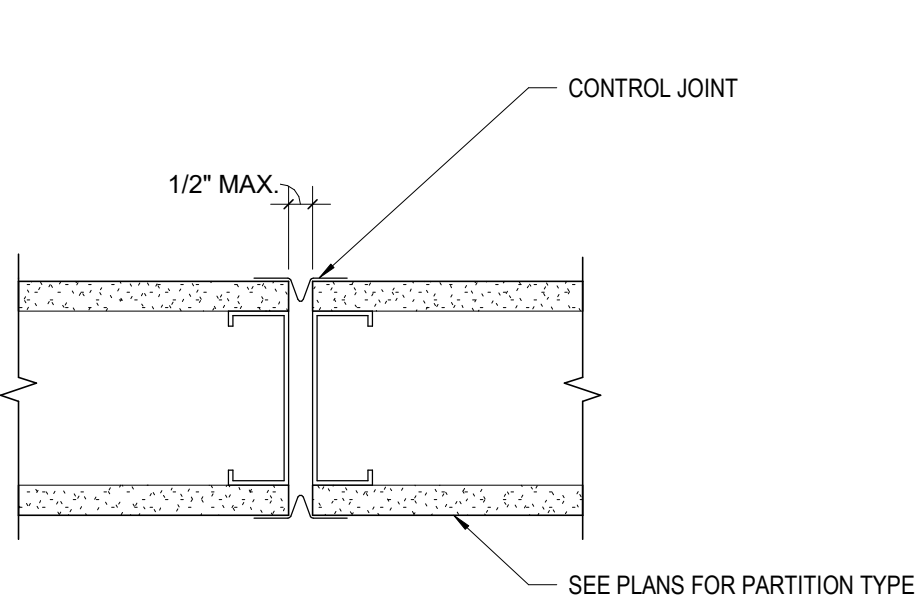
B: ACOUSTICAL CONTROL JOINT
